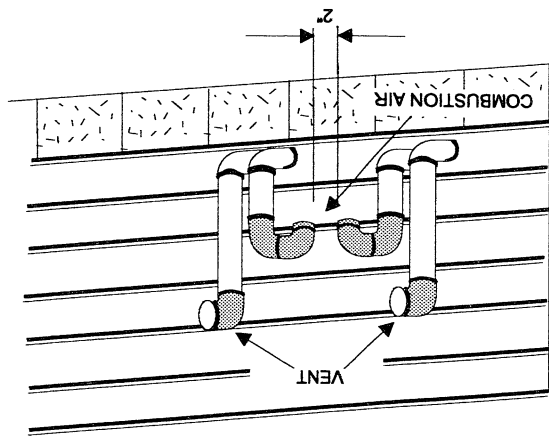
DOUBLE SIDEWALL TERMINATION
